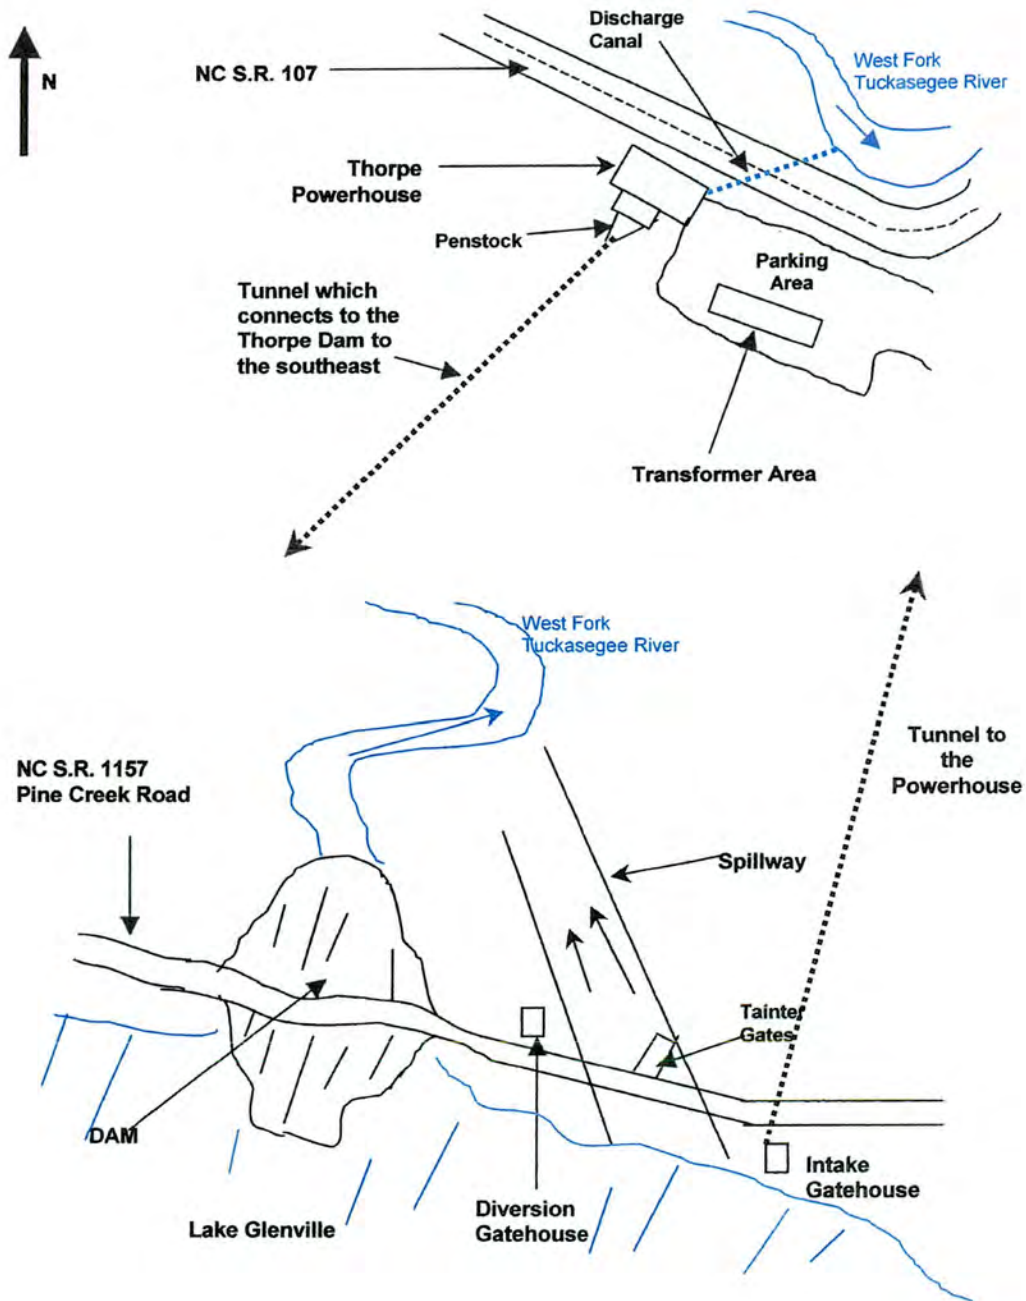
Thorpe Powerhouse and Dam Site Plan.
